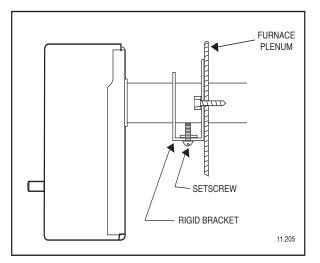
Rigid bracket mounting requires a hole 13/ 16 in. (20.6 mm) diameter for element insertion.
